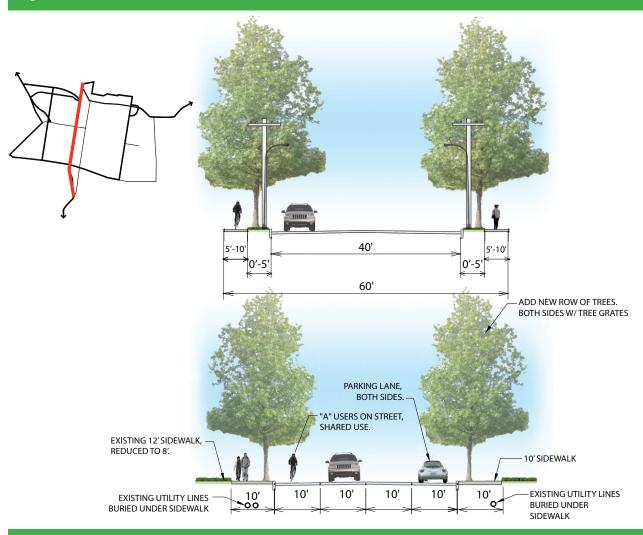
The Hub: Zone 1 4th Street Viaduct to Central Avenue Existing & Proposed Cross-Section
